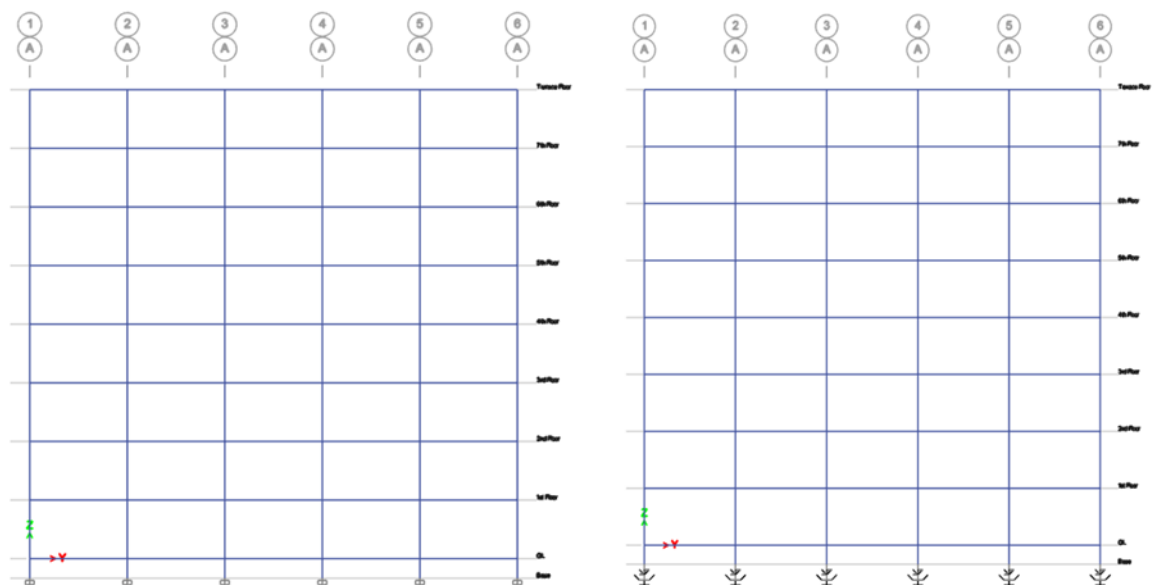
Elevation views of buildings (a) Fixed base, (b) Isolated base.
